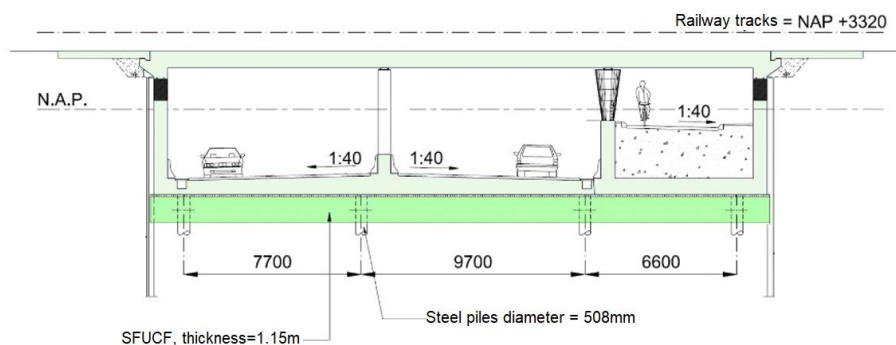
Cross-section of building pit Heinesoweg [22]
